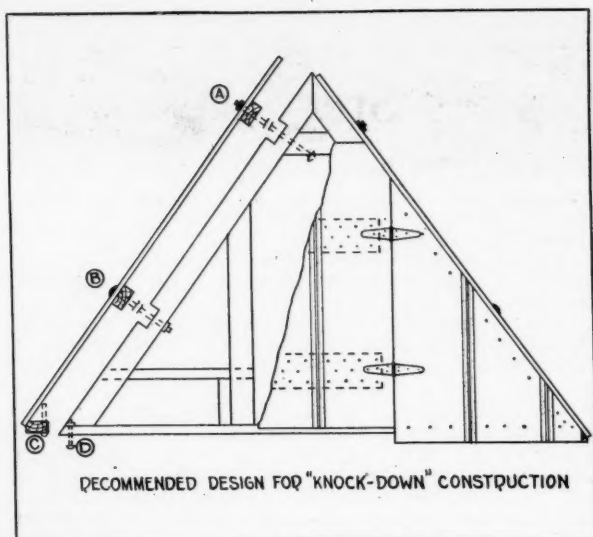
Recommended design for knock-down construction of the Nebraska hog house
